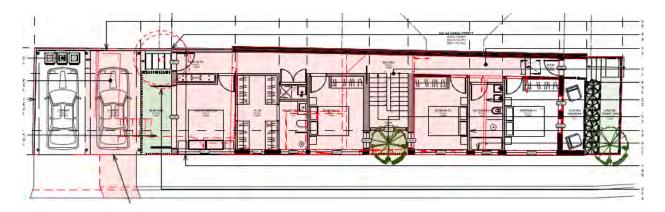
Ground Floor Plan demonstrating the proposed building footprint
